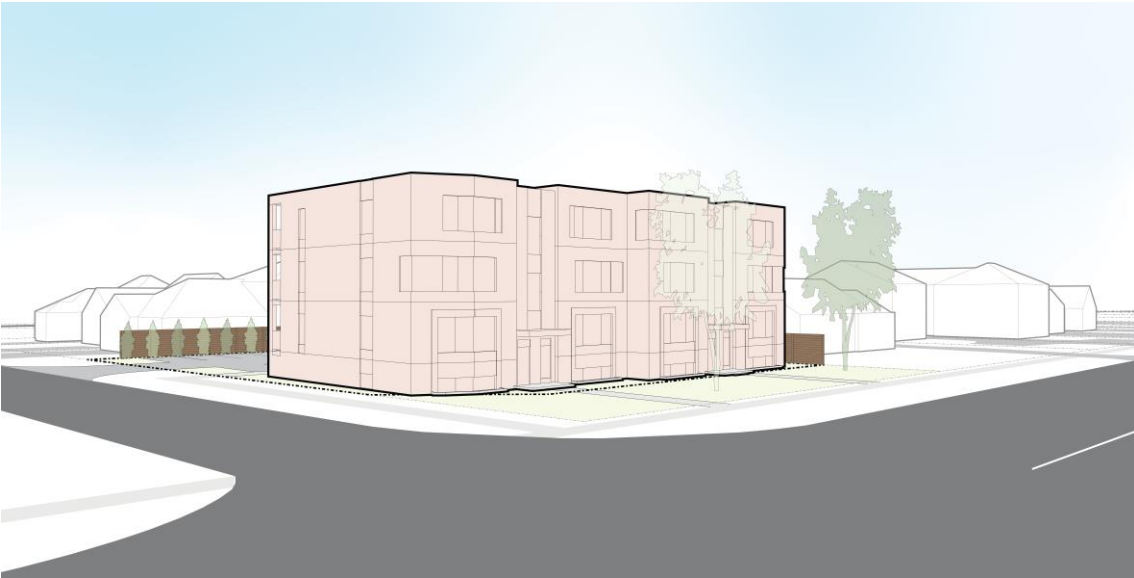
Rendering of proposed building – view from Southdale Rd E
